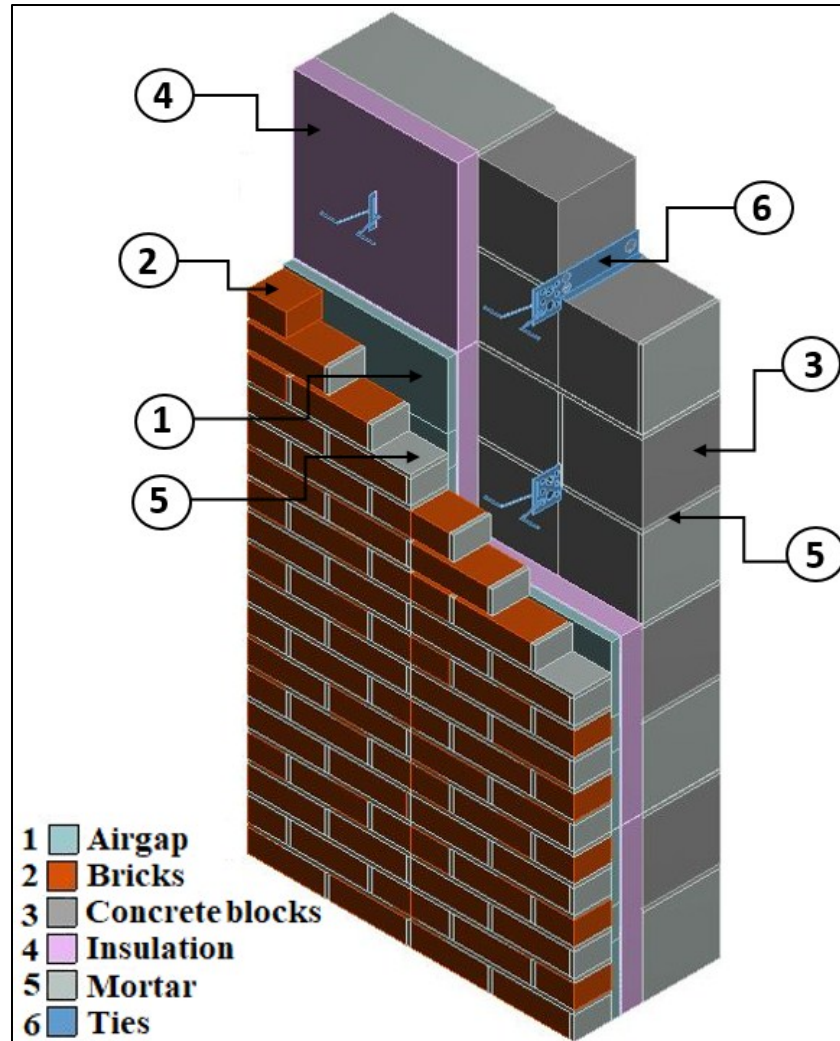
Components of a concrete-block clear masonry cavity wall
